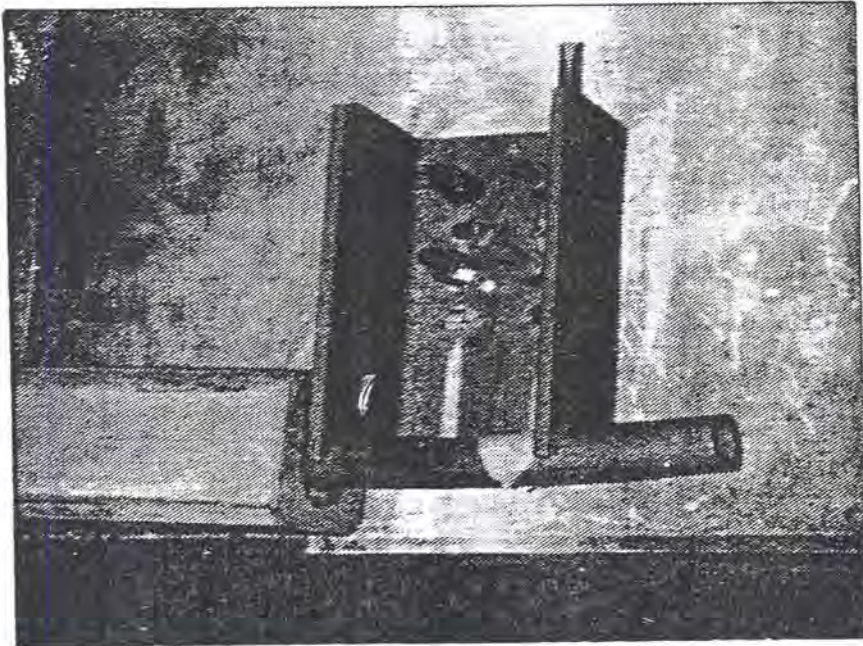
Structural steel bracket bolted to the side of a beam at a low point; The PT is encased in concrete for protection
